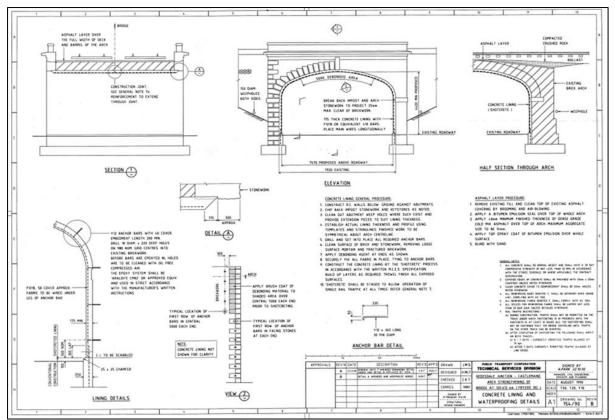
Fryers Rd Rail Bridge Chewton - SDMBGO-BR-120612. Concrete Lining Design 1990 (VicTrack)
